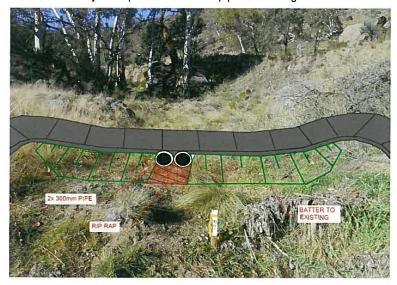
Location 1 Option 3 Low Level Causeway with culvert
